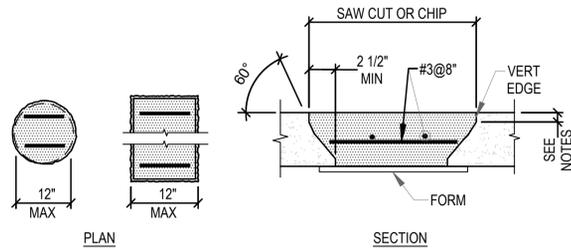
DETAIL - REPAIR @ UNDERSIDE/SIDE OF BEAM
